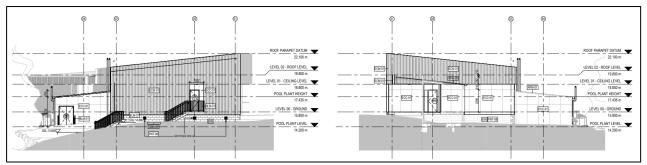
Eastern (left) and Western (right) Elevations of proposed pool facility (*Source: External Elevations Plan, prepared by Populous, 15 December 2023*)
